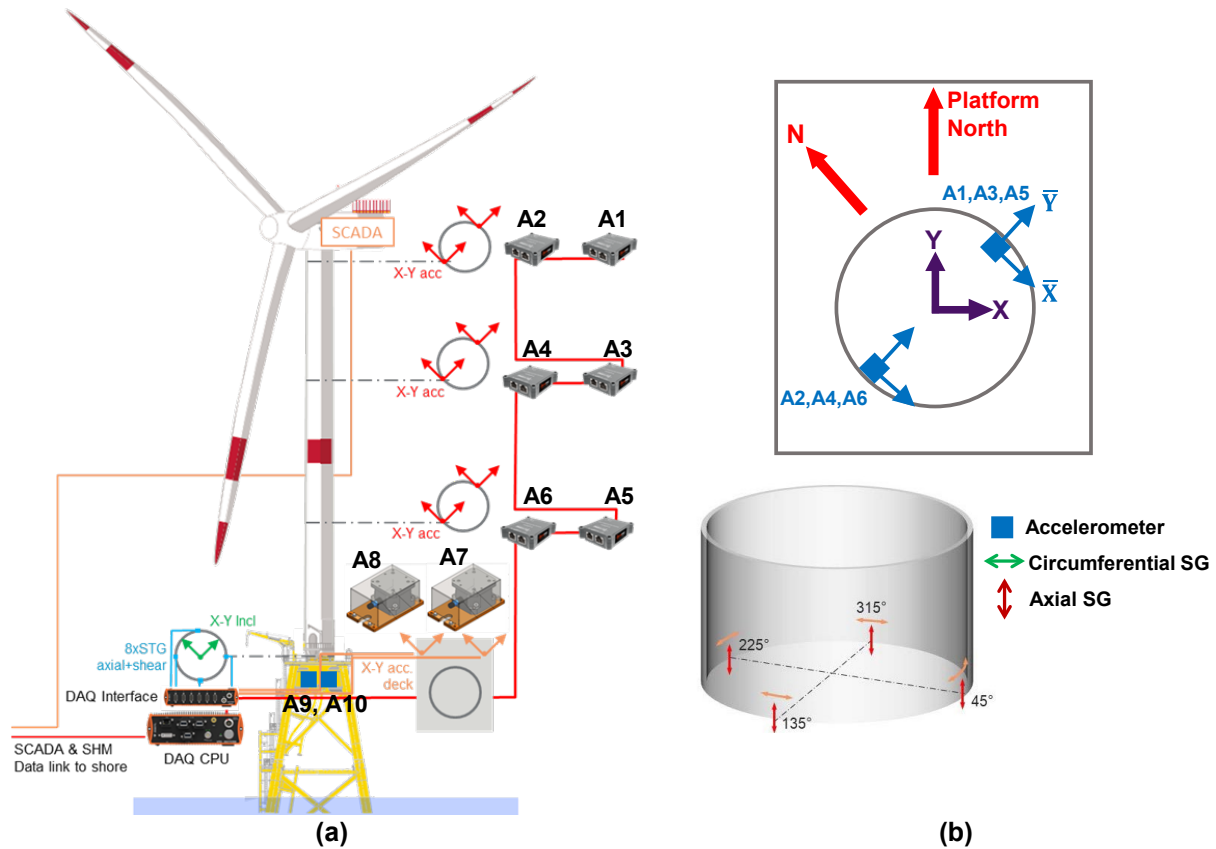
Elevation (a) and top view (b) of instrumentation plan.
